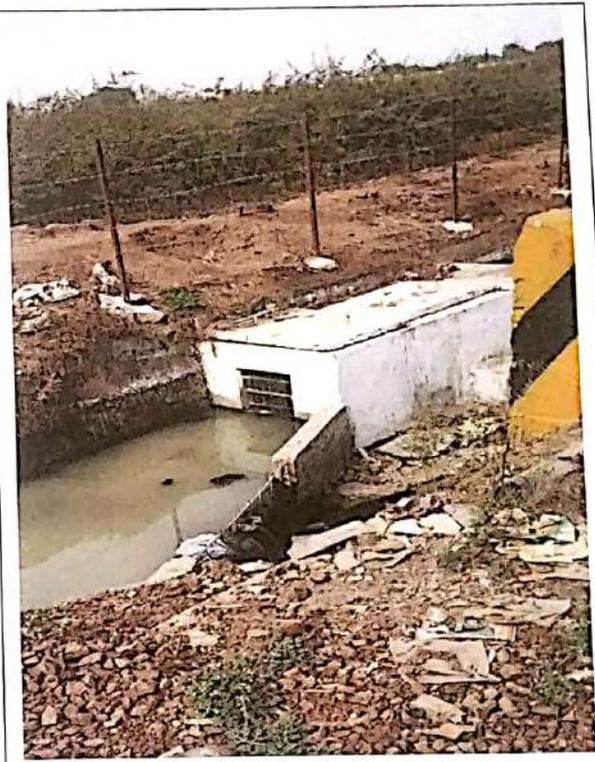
Construction of Collection chamber in Unad Nallah in Shegaon City
